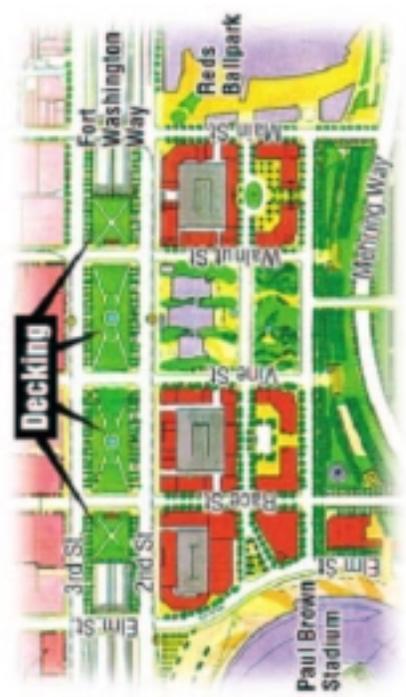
Rendering of proposed caps over Fort Washington Way
